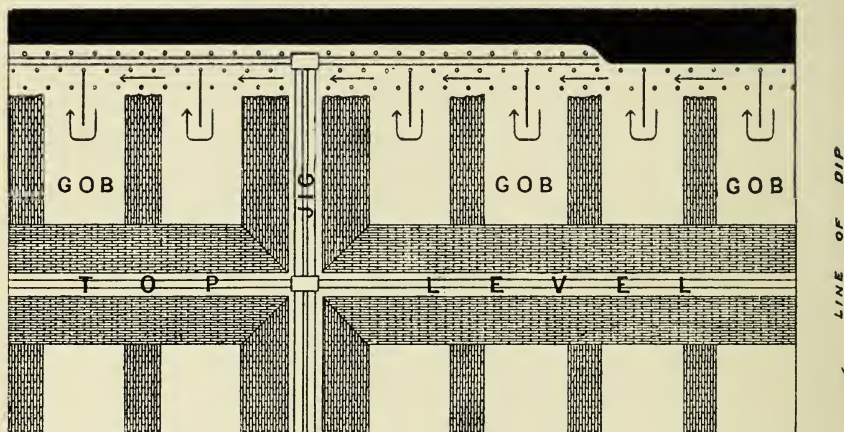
FLORENCE COLLIERY, LONGTON, NORTH STAFFORDSHIRE. PLAN OF LONGWALL FACE WITH THE GATE-ROAD AND PACKWALLS CONNECTED WITH IT, IN THE GREAT ROW COAL.
